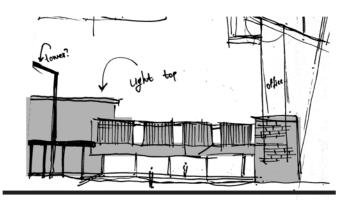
Materiality of street-facing facades considered on elevation
